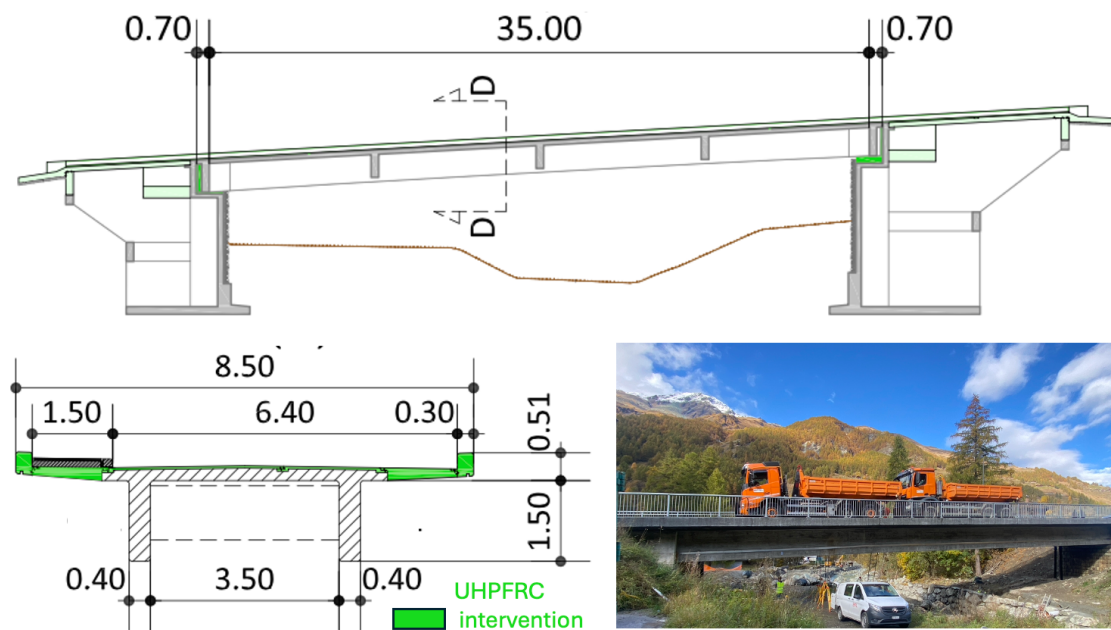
Ferpècle bridge presentation. Top: Elevation. Bottom left: Cross section; Bottom right: Static load testing on the bridge.
